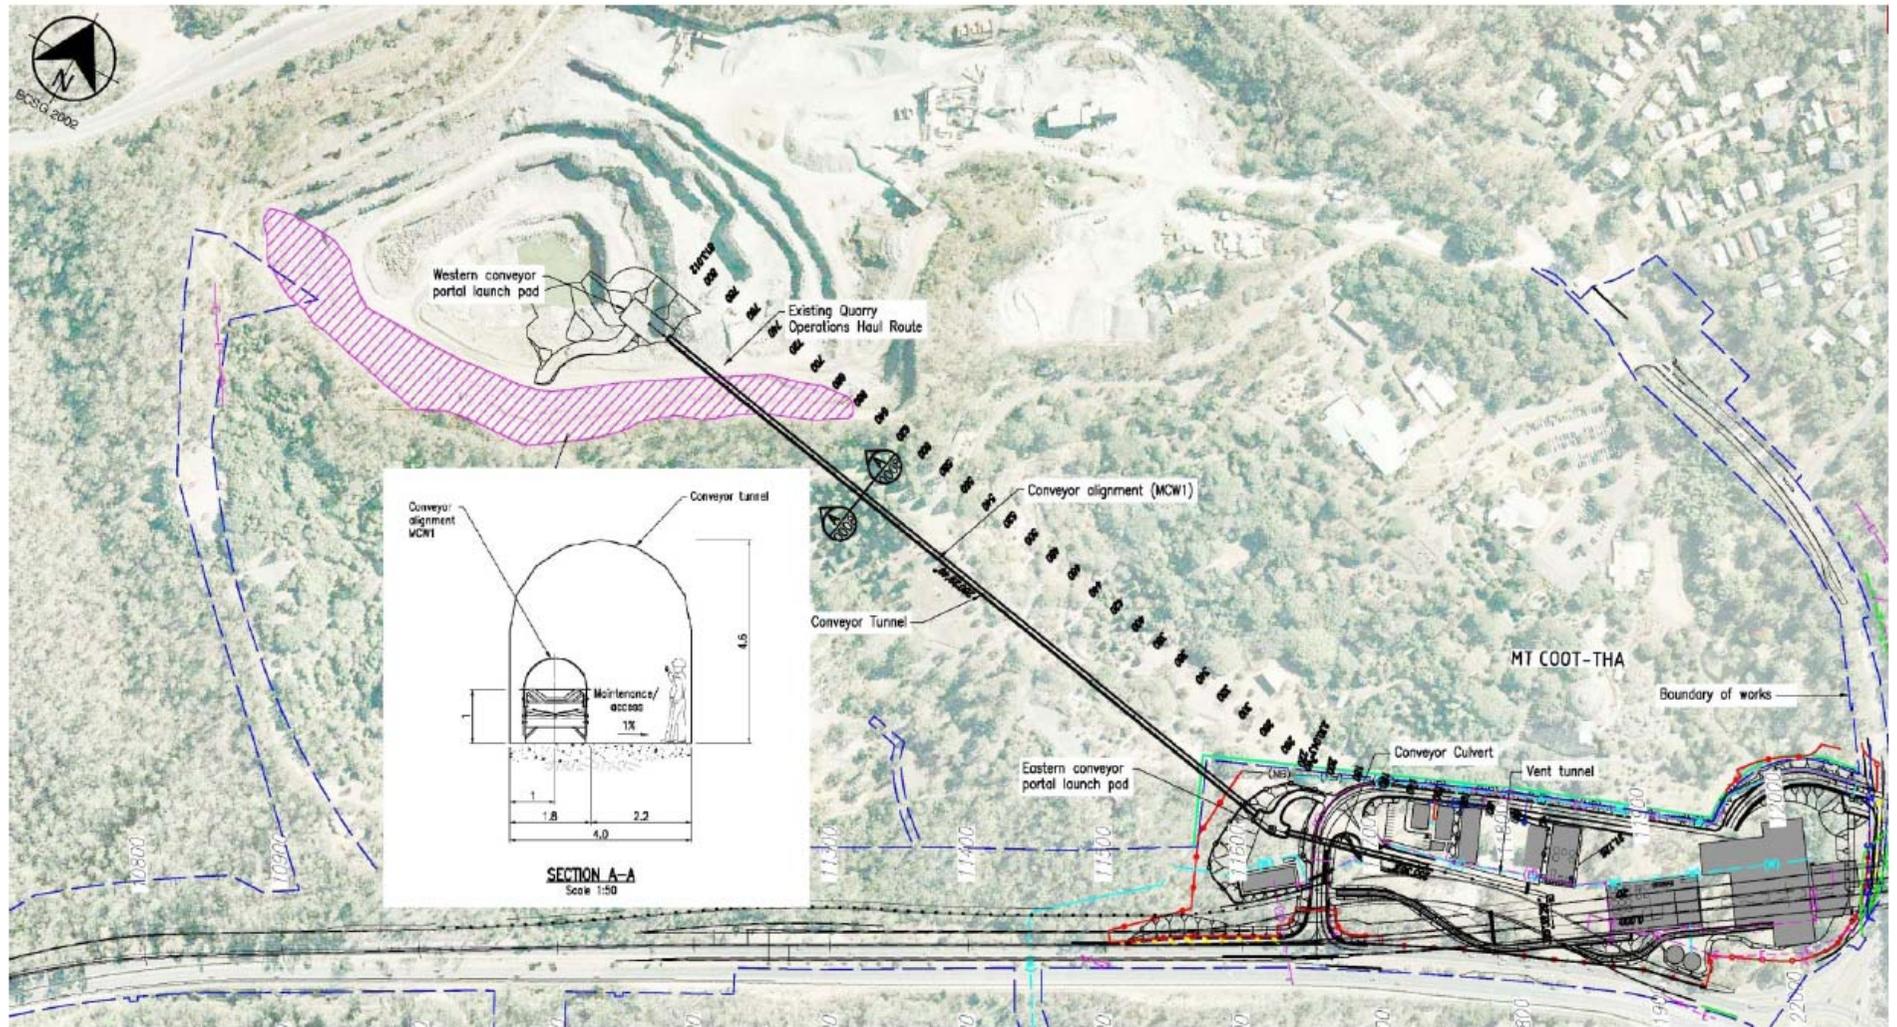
Proposed changed design—spoil conveyor tunnel
